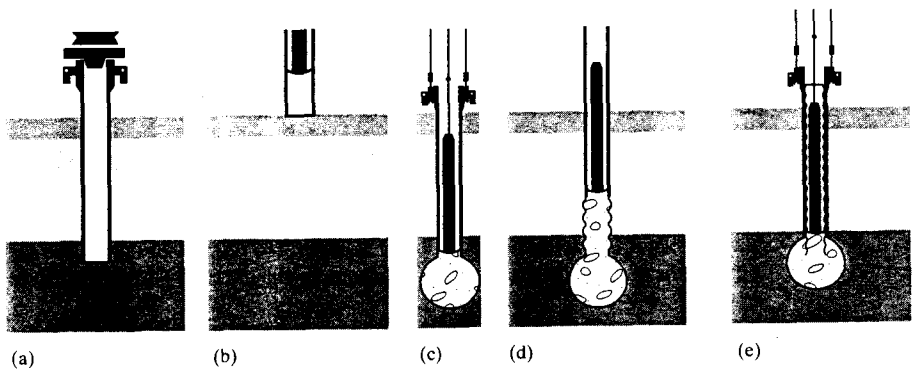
Construction of a PIF foundation: (a) top driving; (b) bottom driving; (c) finished base; (d) uncased shaft; and (e) cased shaft (Adapted from brochure by Franki Northwest Co., used with permission.)
